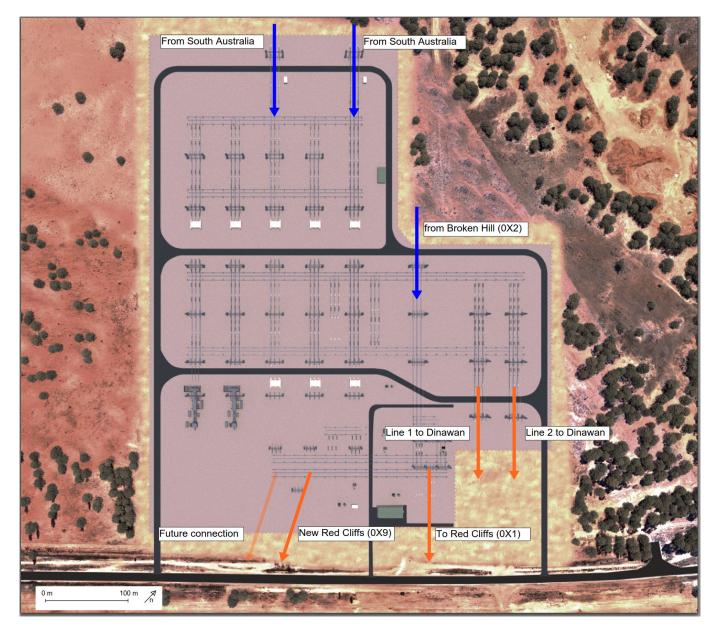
Arrangement of the proposed substation layout (indicative)
